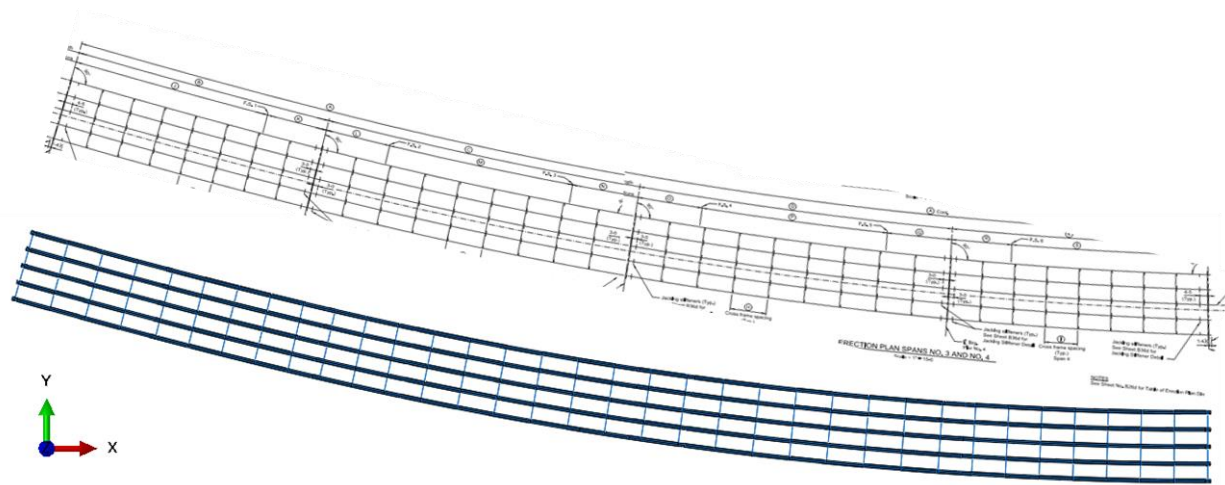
Framing plan excerpt from Drawing No. 23371 (top) and framing plan in the FE model (bottom).
